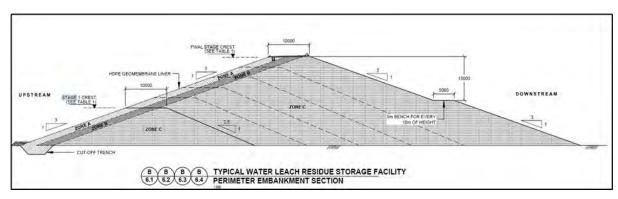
Typical Water Leach Residue Storage - Perimeter Embankment Section
